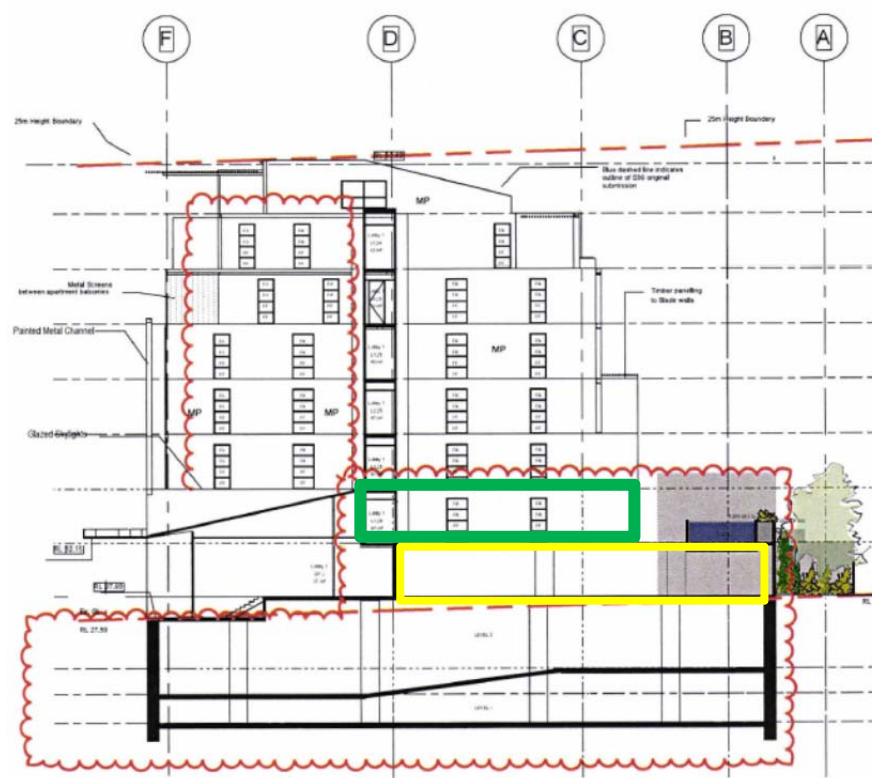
shows the S96B building envelope, the location of the additional apartments (outlined in green) , ground level parking (bounded in yellow) and for comparison purposes the originally approved building envelope (shaded grey)
